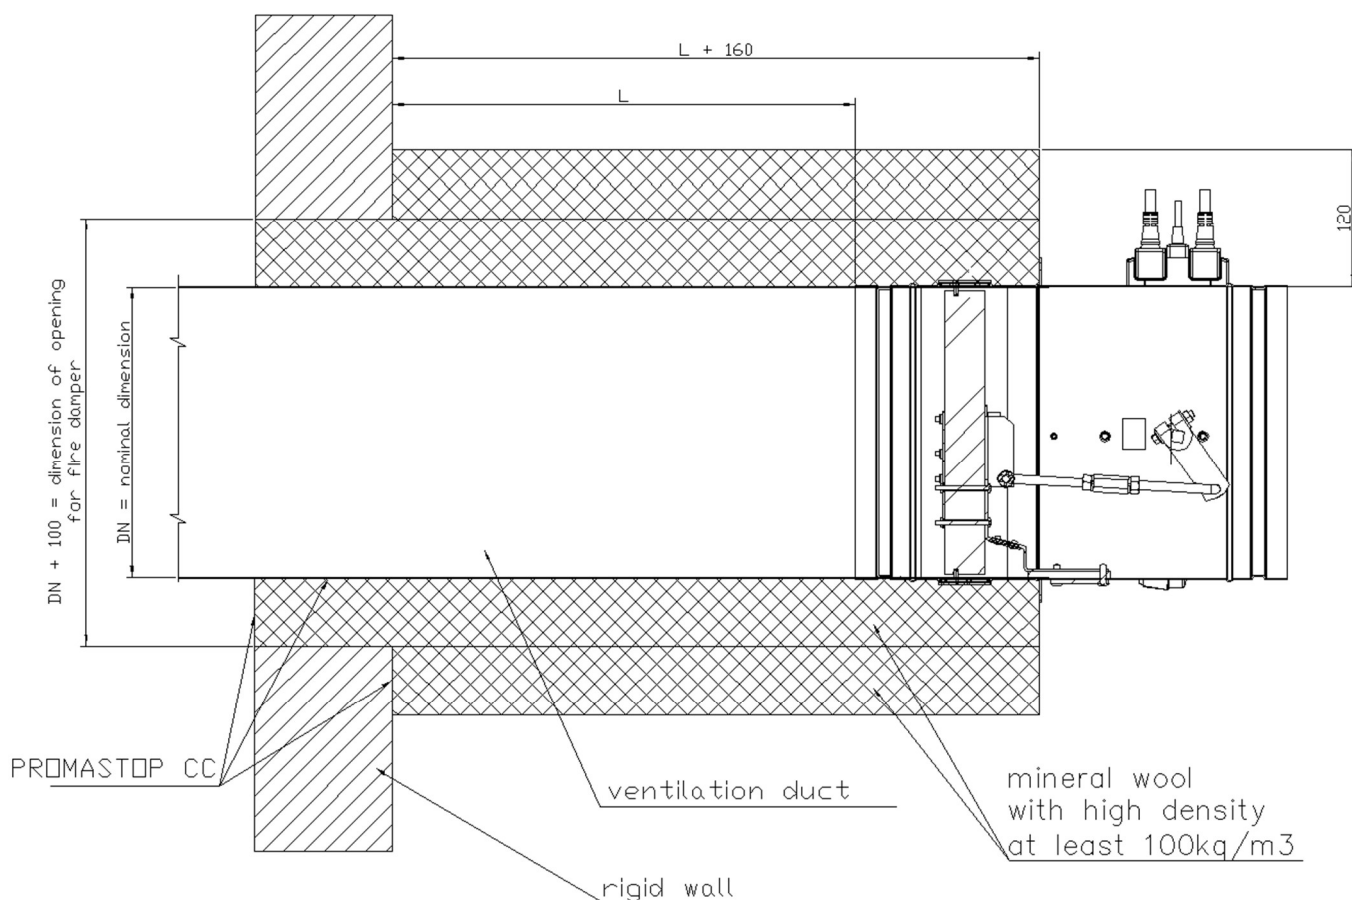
Installation method of fire dampers KTS-O away from wall constructions
